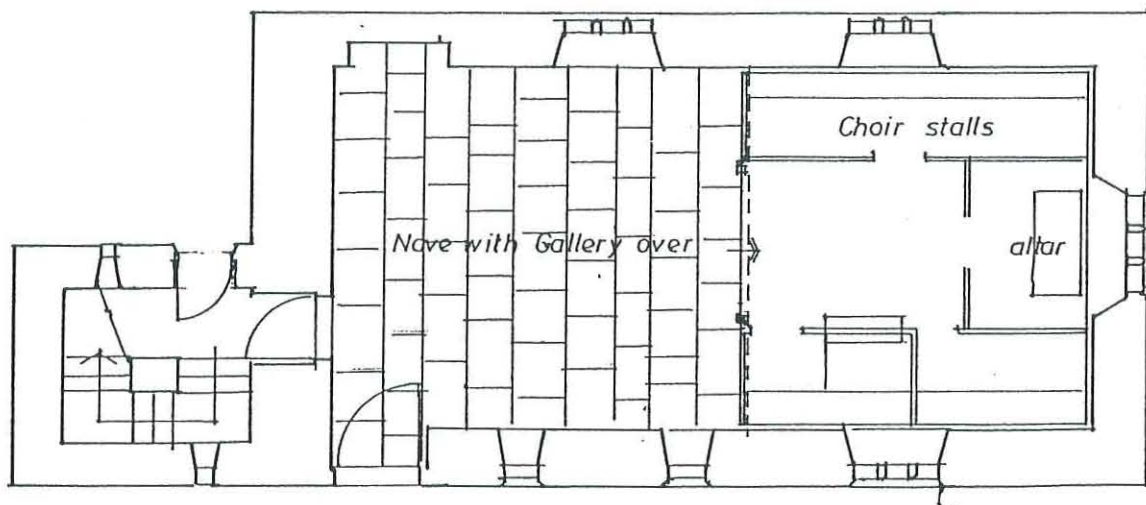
Ground-floor plan of the chapel at Dilston Castle
